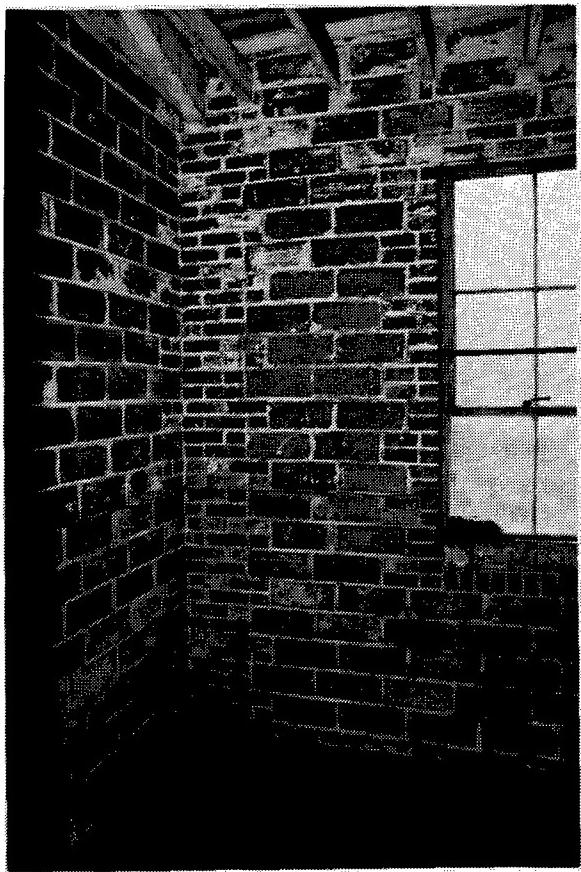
Building DT-33: Interior of this Flammable Materials Storehouse.
